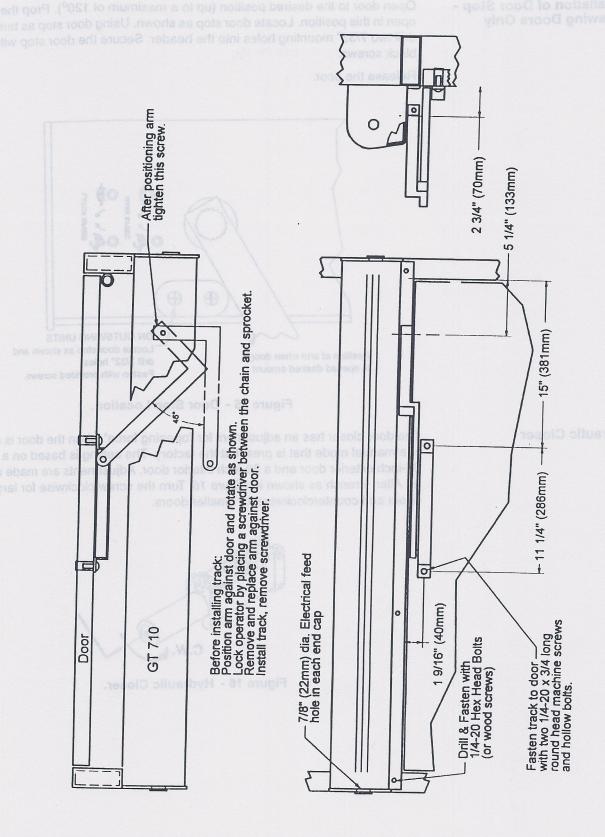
Installation Details, Left Hand Inswing Up to 3 1/4" Reveal.
